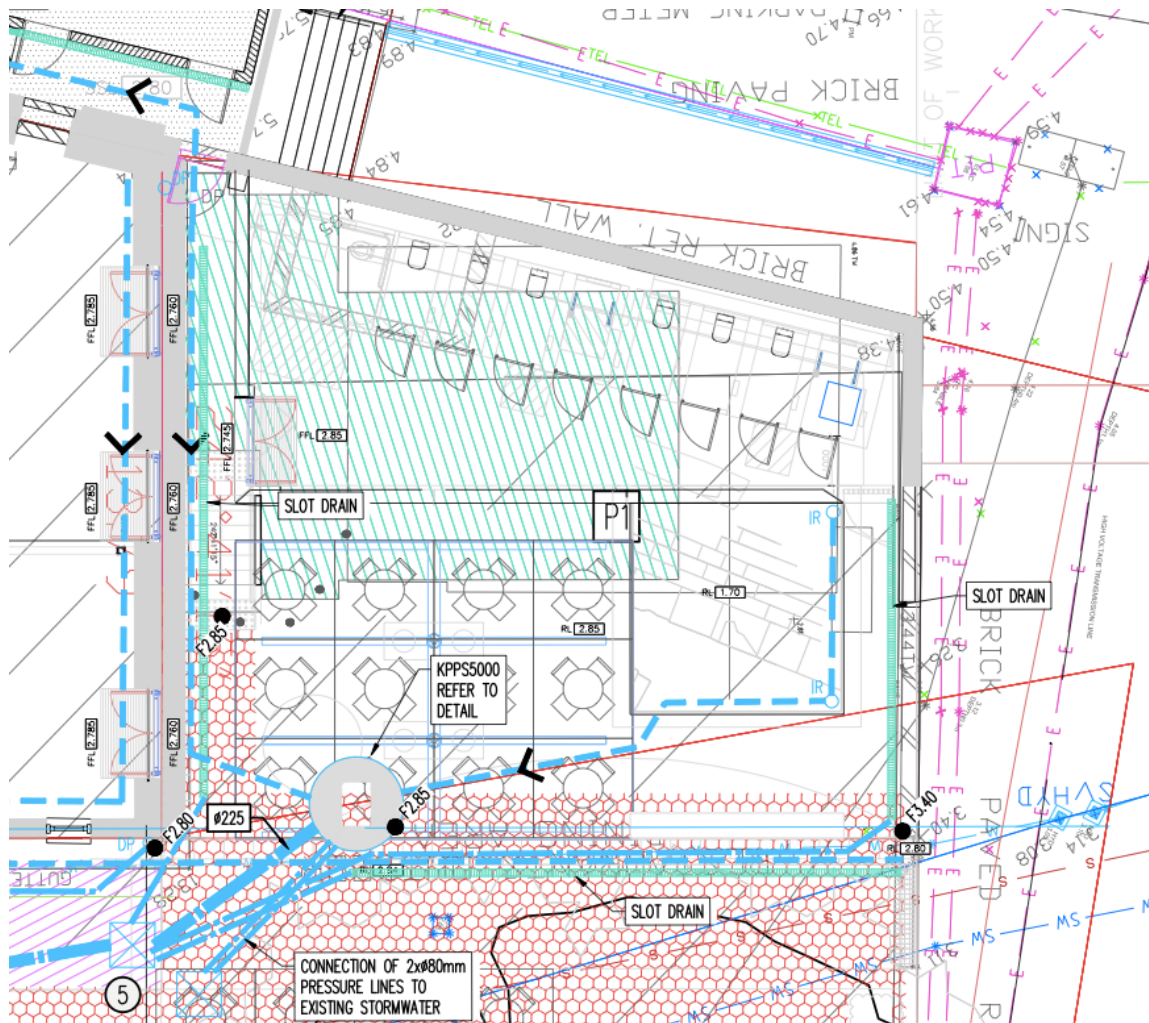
Plan showing location of proposed drainage in viewing window and location of pump-out tank. Note north is to rhs of page. (Source: TTW plan C105-I_180309)
